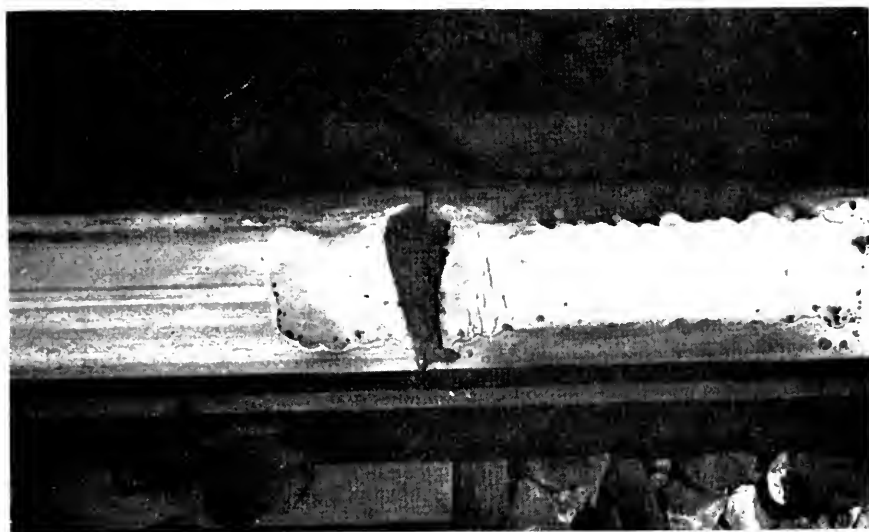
Photograph of joint 9 showing a large chip broken off both rail ends.
